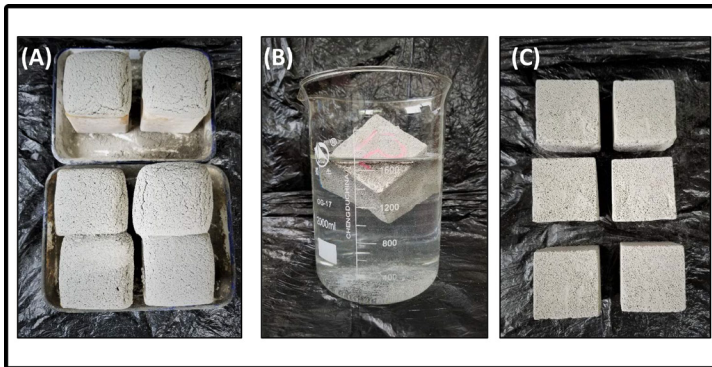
Expanded Concrete (A), Controlled Sample (B), Final Porous Concrete (C)
